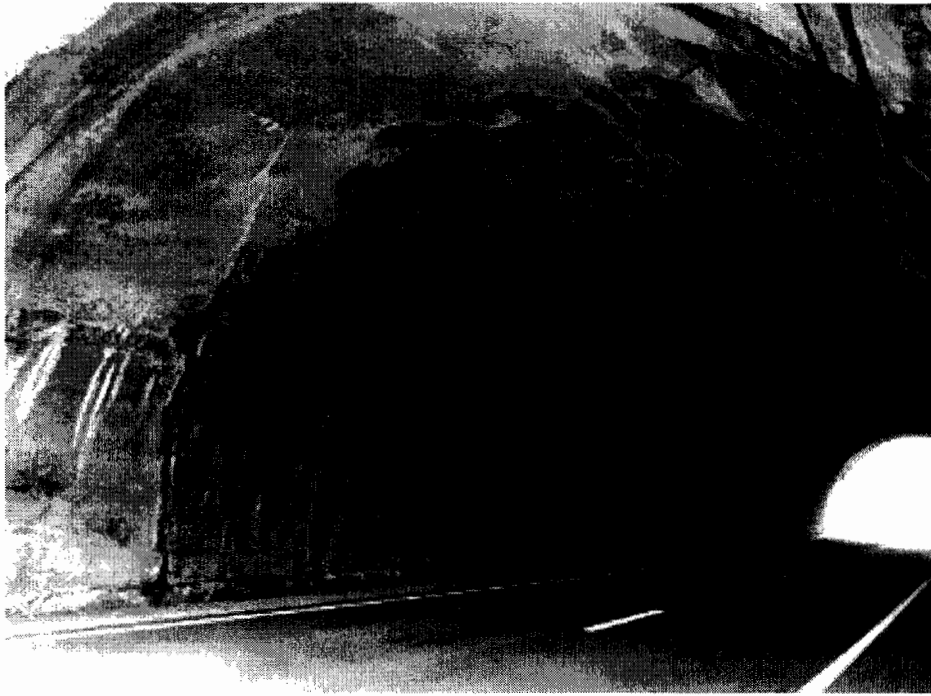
Interior of the arch barrel showing later concrete repairs at the face.
